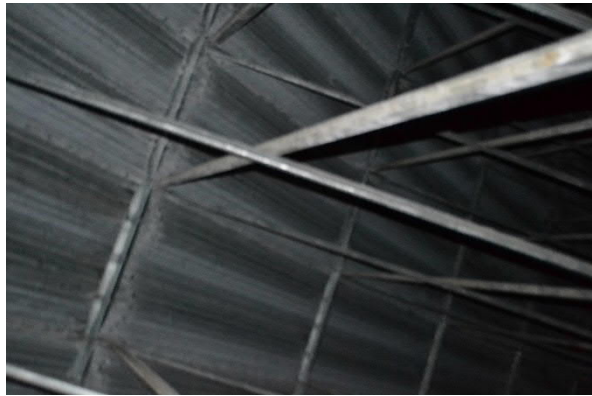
Overview Truss Connection to Ribbed Corrugated Sheathing
